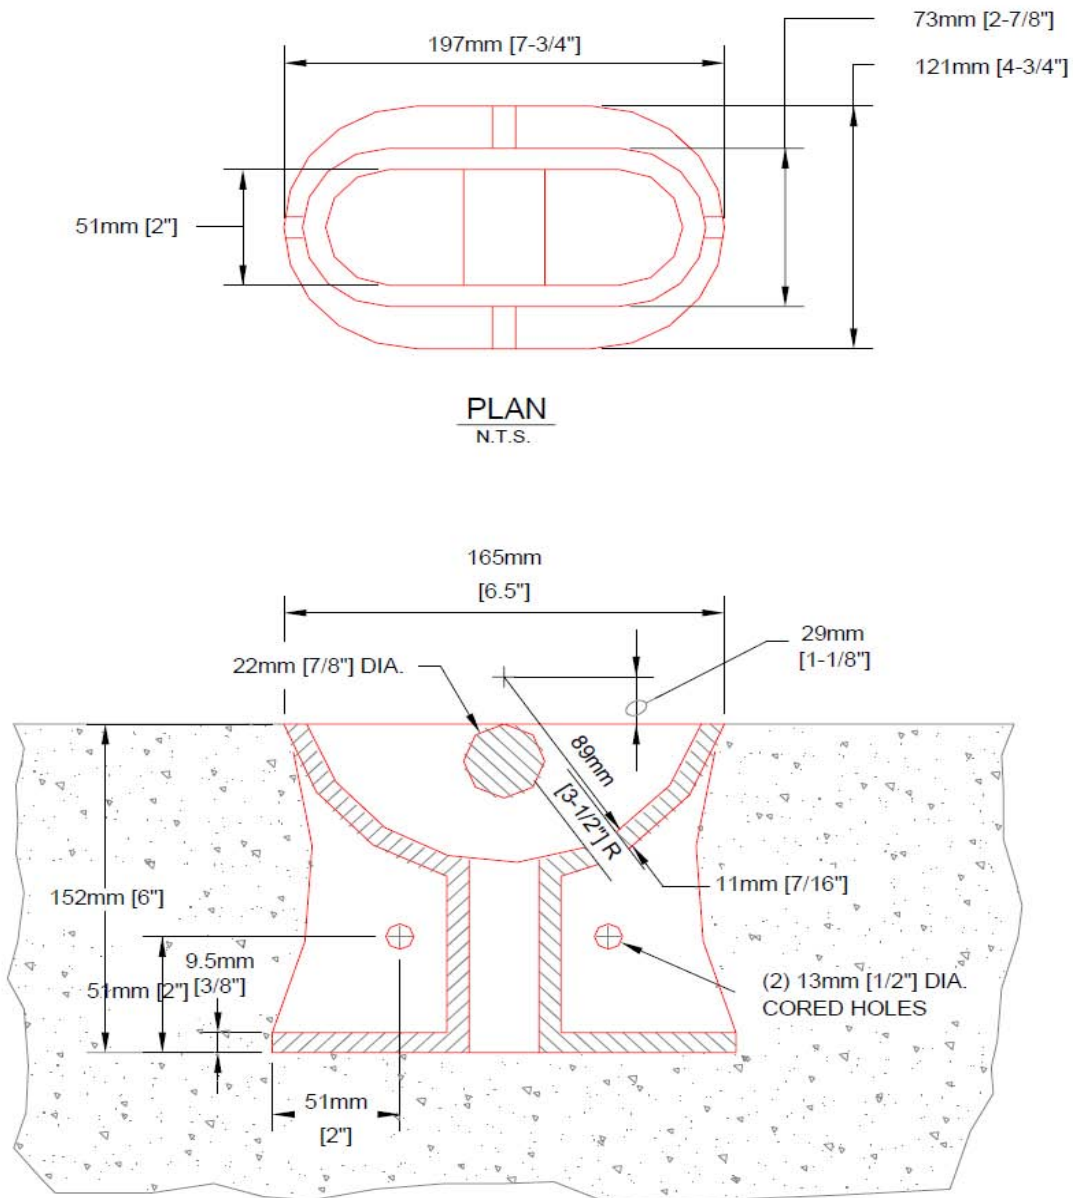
Plan and Elevation View of Installed Neenah Mooring Eye⁽²⁾
